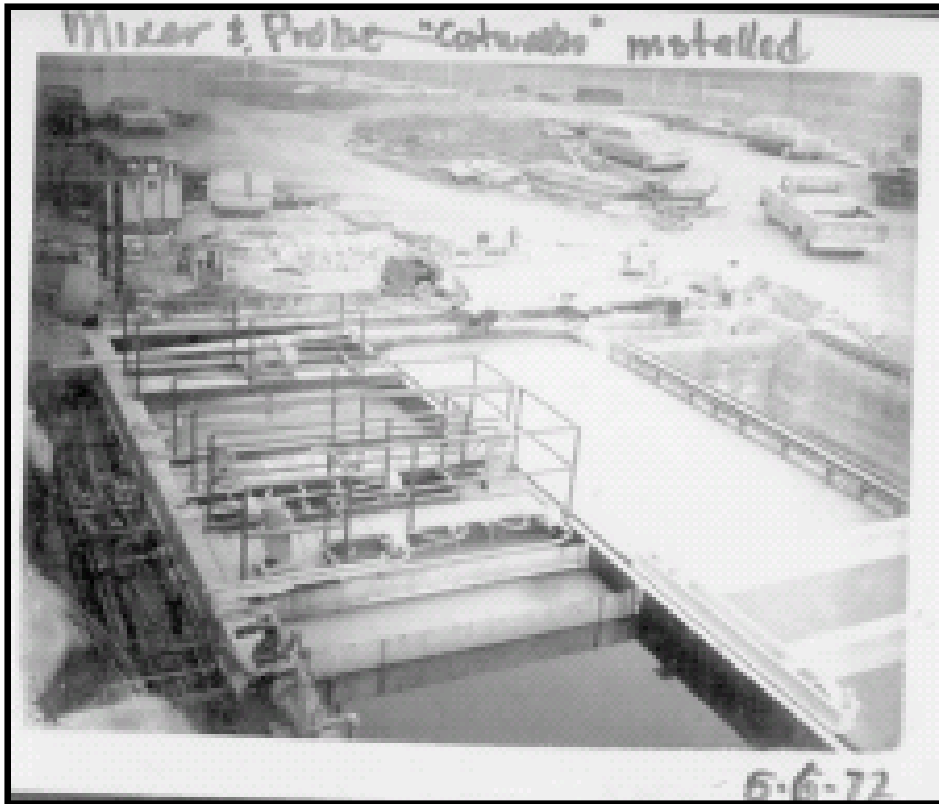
View looking north from WWTP roof at new Precipitation tank.
